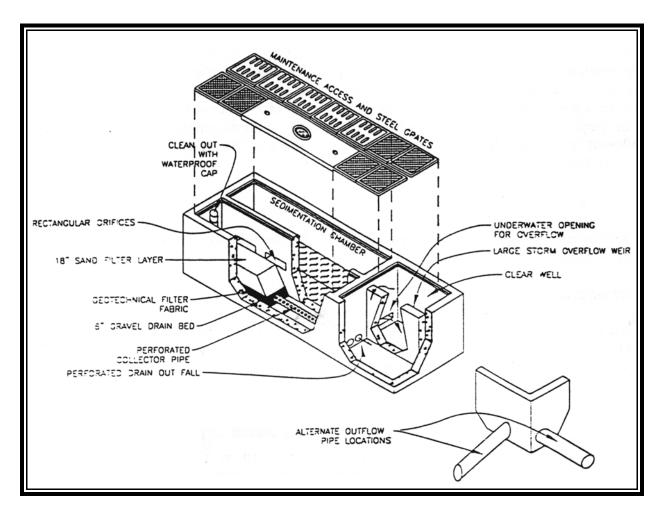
B-1 shows a schematic drawing of the Delaware Sand Filter as used in Virginia. The system consists of two parallel concrete trenches connected by close-spaced wide notches in the wall dividing the trenches. The trench adjacent to the site being served is the sedimentation chamber. When accepting sheet flow, it is fitted with a grated cover. Concentrated stormwater may also be conveyed to the chamber in enclosed storm drain pipes. The second chamber, which contains the sand filter, is always fitted with a solid cover.
